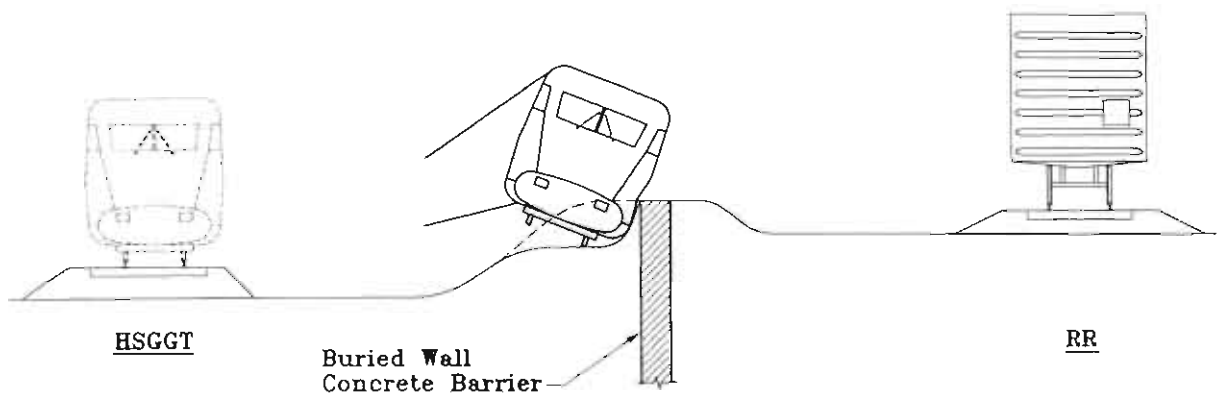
COMBINATION BARRIER - BURIED CONCRETE WALL
